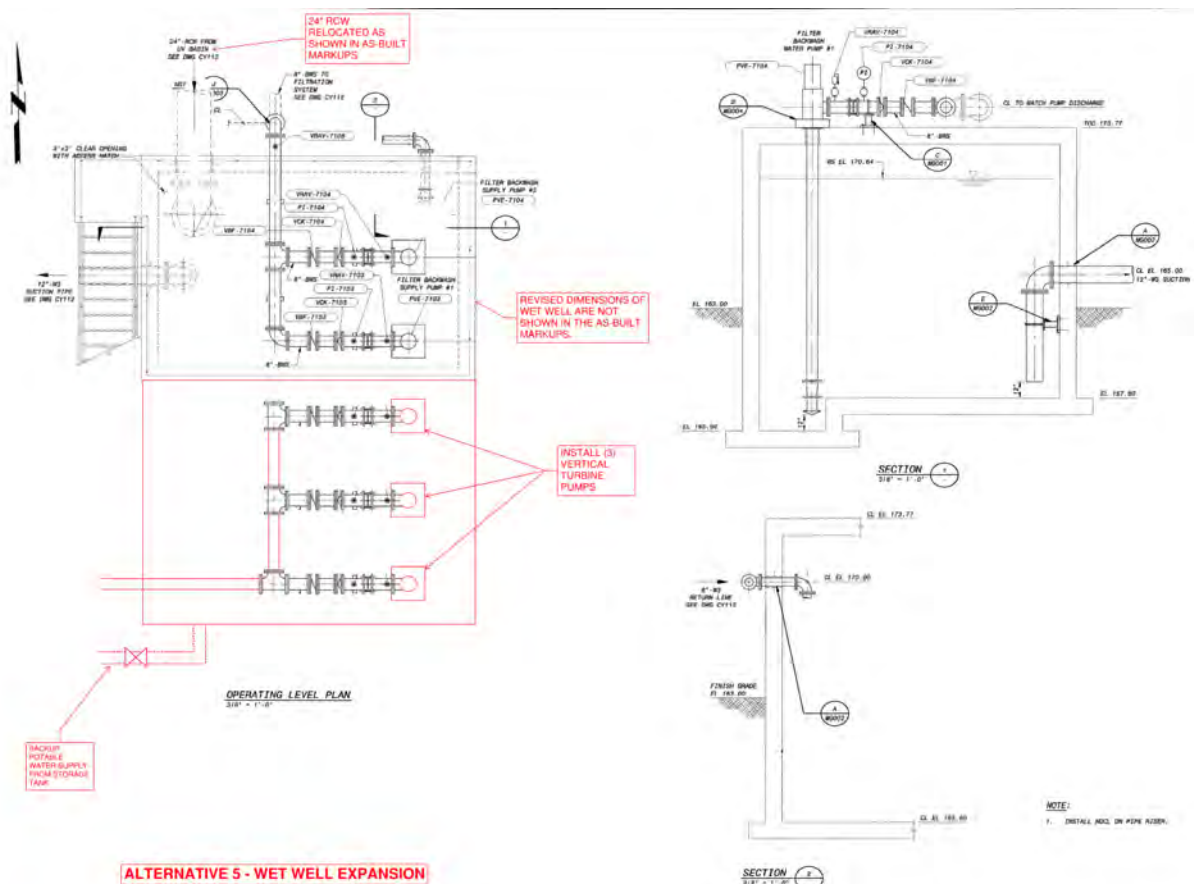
Reclaimed Water Pump Station and Wet Well Expansion Sketch
